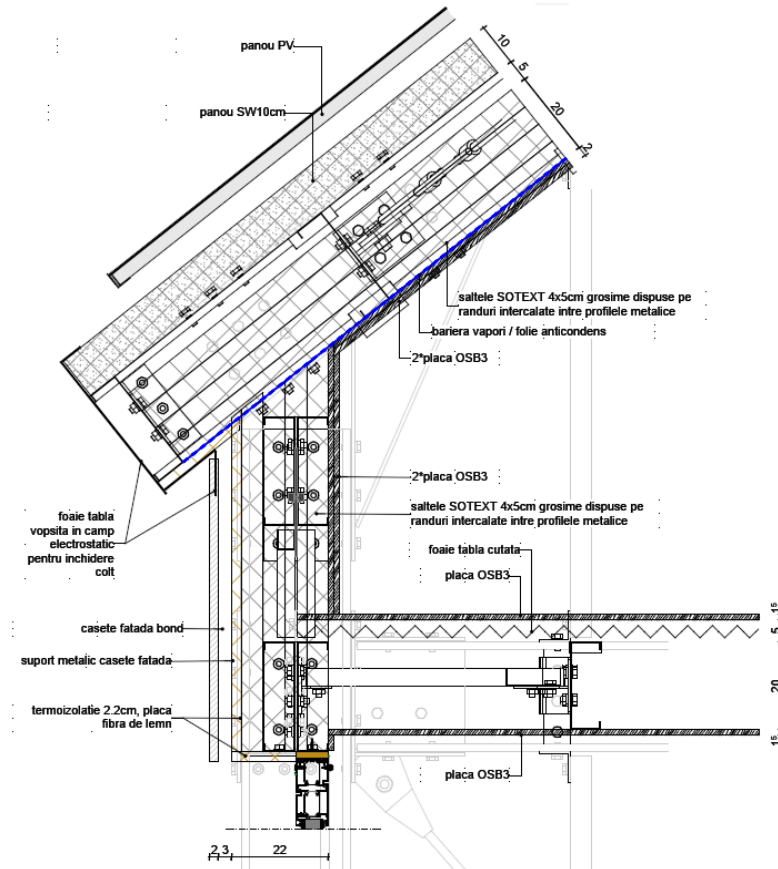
Construction detail – Joint area of the roof with the wall layers
